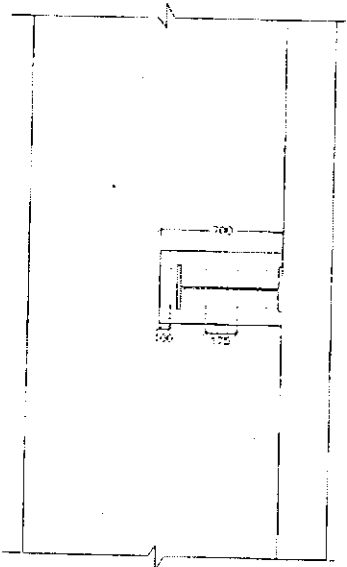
POSITION OF STEEL CROSS GIRDERS IN BETWEEN THE LONGITUDINAL GIRDERS
